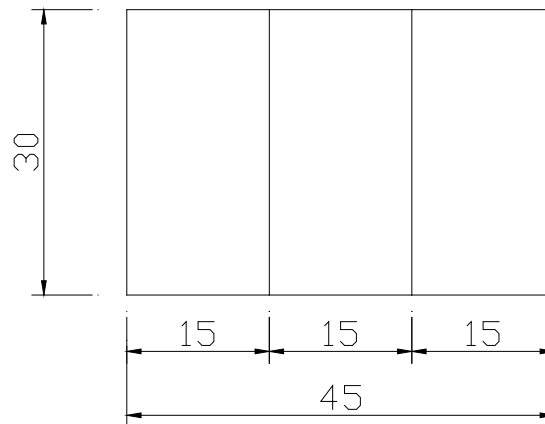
The plan view of the low-rise residential building (unit: feet)
